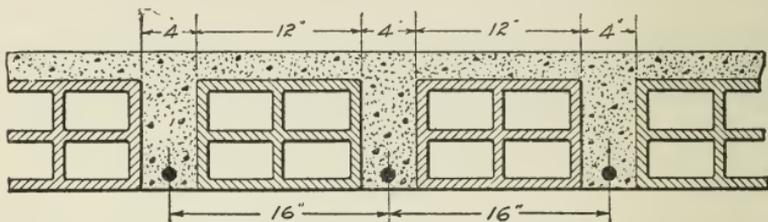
Natco "One Way" combination long span floor with 2" concrete top.
